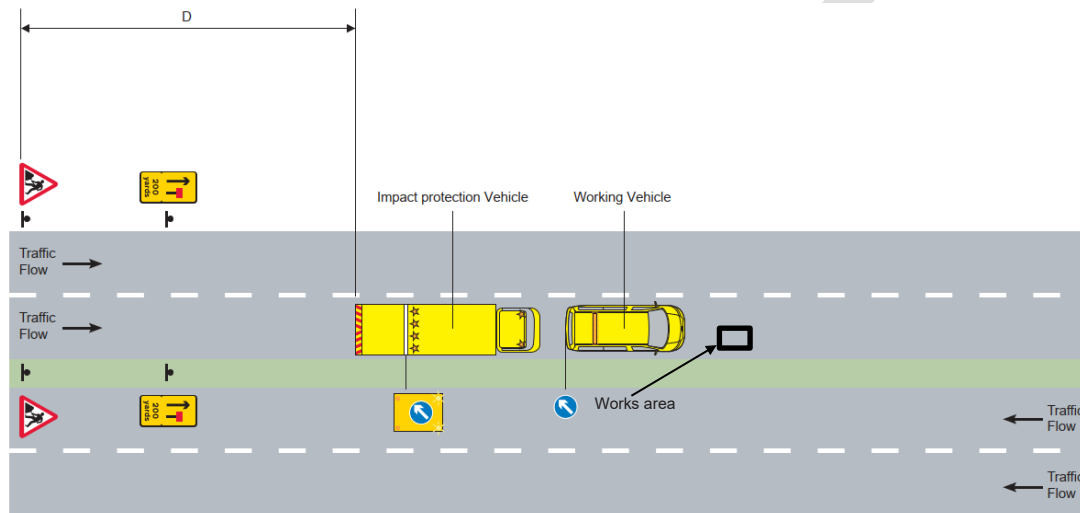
Short duration works less than 15 minutes on a single carriageway road
